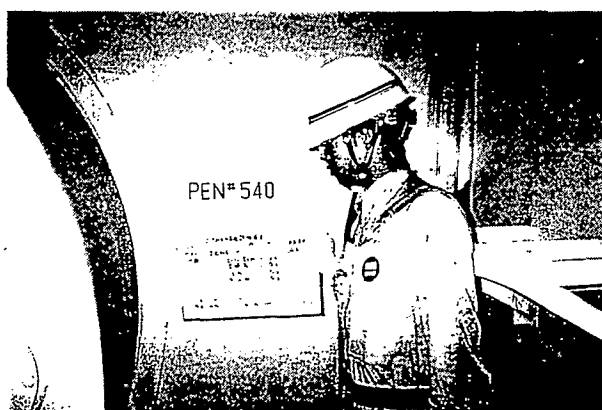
Visual Inspection on Surrounding Concrete of Opening (QGN#3)
